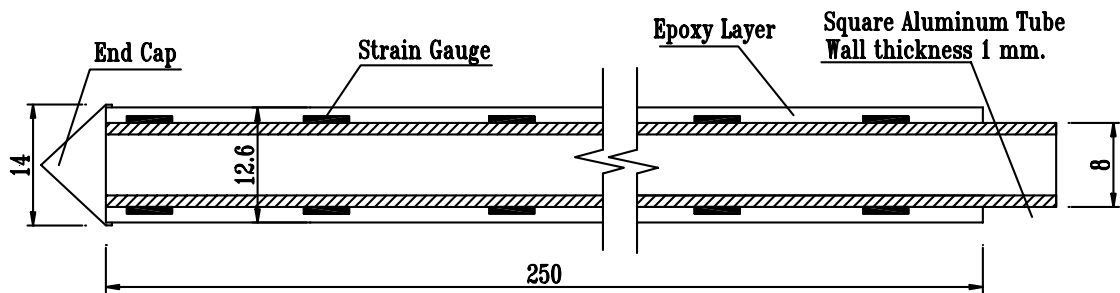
Sketch of Instrumented model pile (Dimension in mm)
